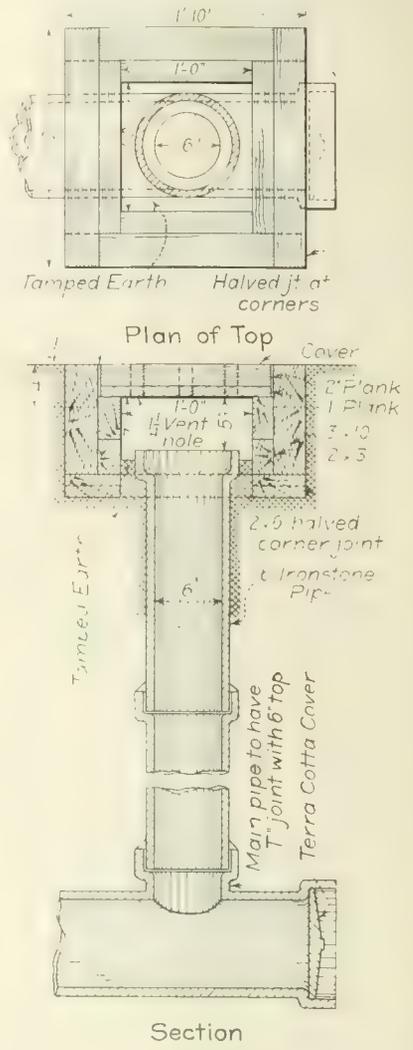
Plan of Top and Section of Standard Lamphole, Sewerage System, Panama-Pacific Exposition.
